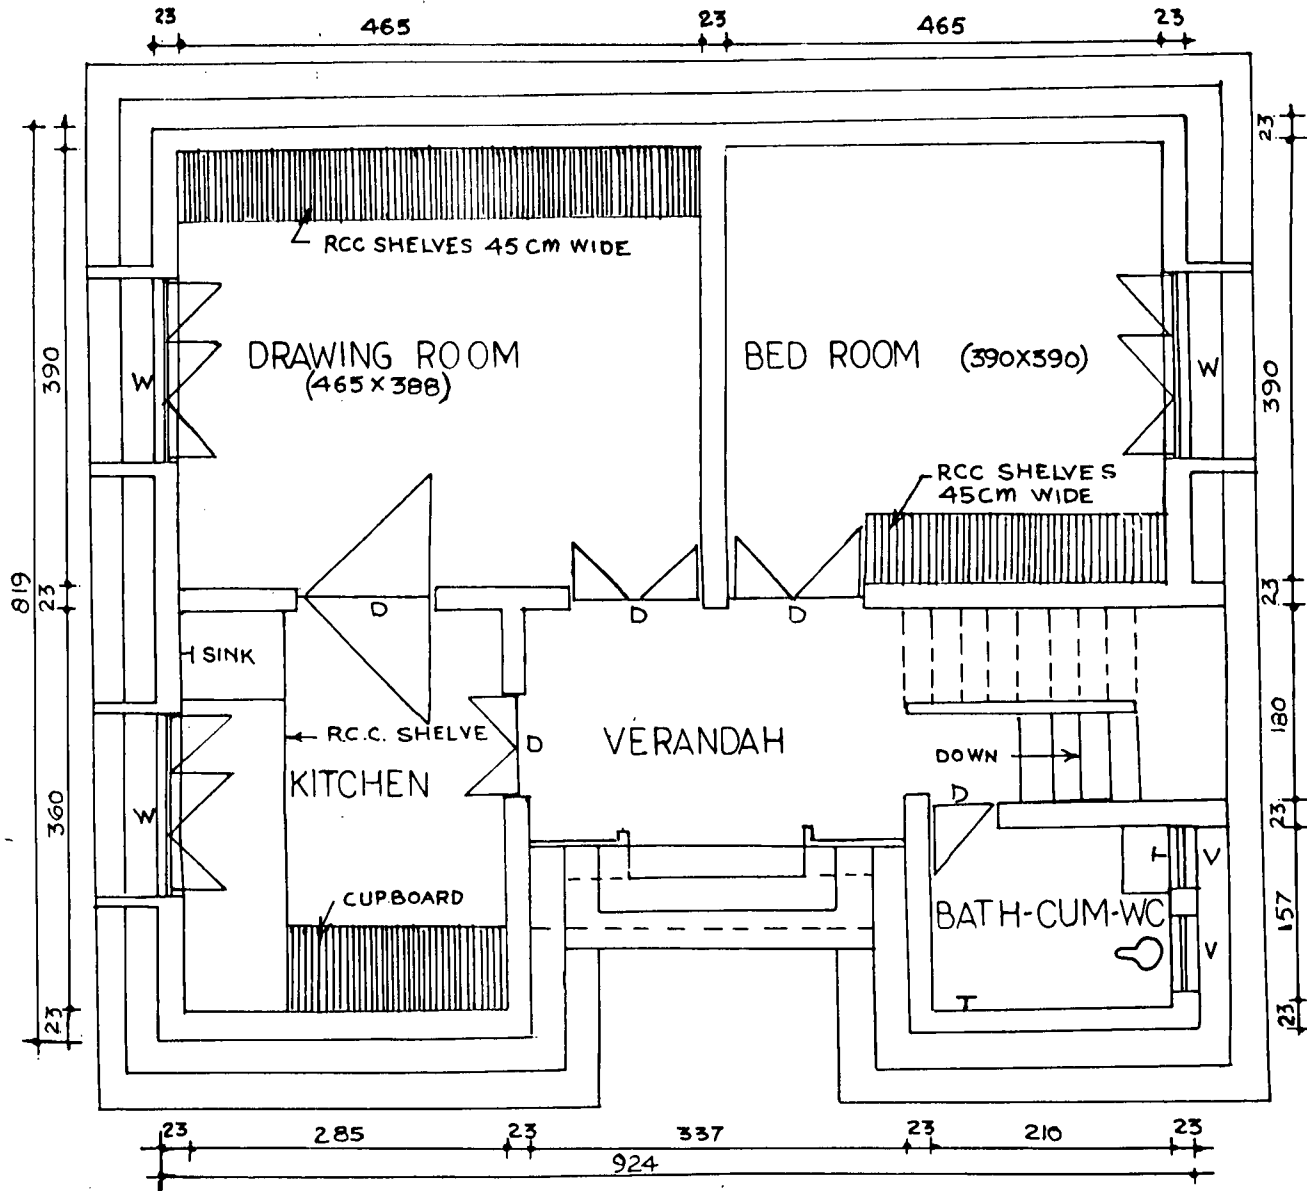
GROUND FLOOR PLAN OF OFFICE CUM RESIDENCE BLOCK.
